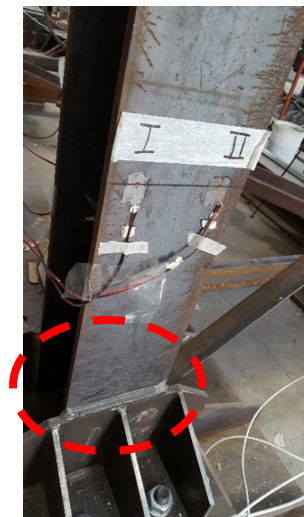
Undamaged T-stub belonging to the second level at the end of Test 7
